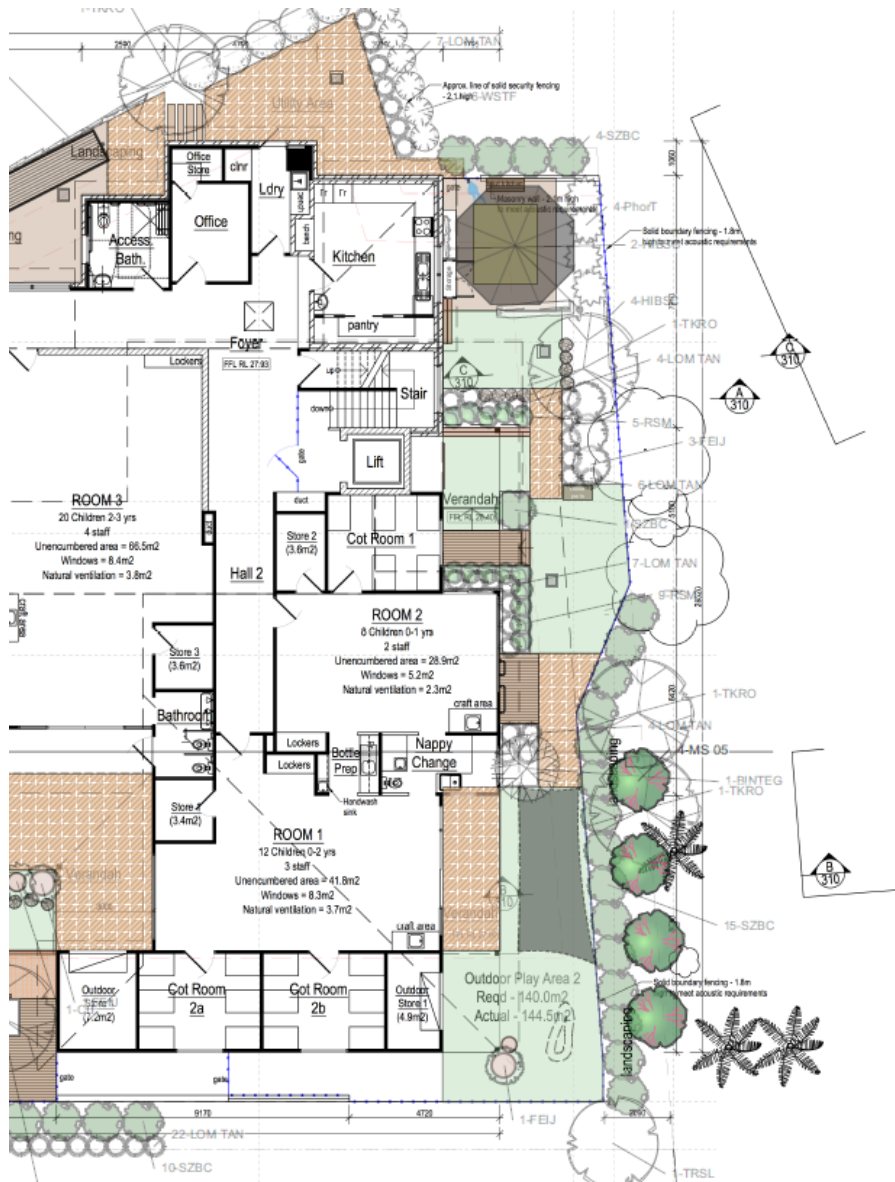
Landscape plan identifies footprint of adjoining buildings.
